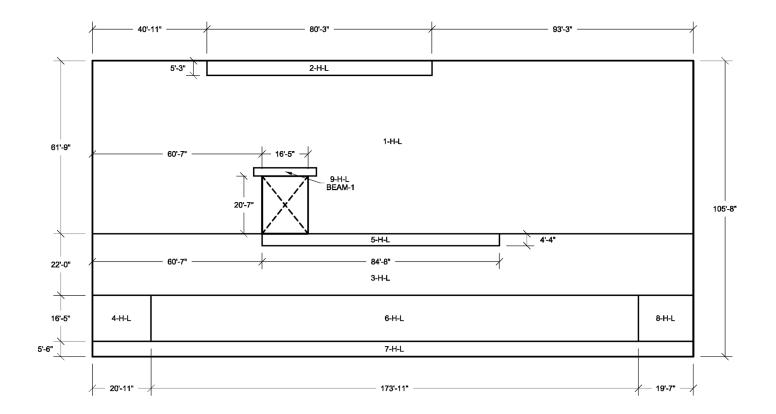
H.3-15 South Wall Looking North Horizontal Reinforcement Zones Far Side Face
